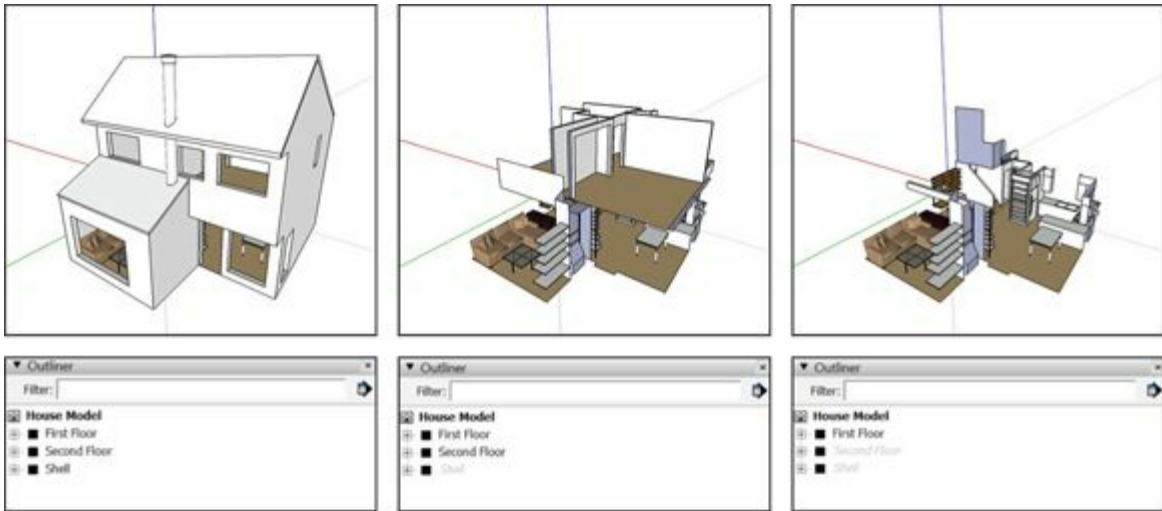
Each floor of the house, as well as the roof and the exterior walls, is a group.
